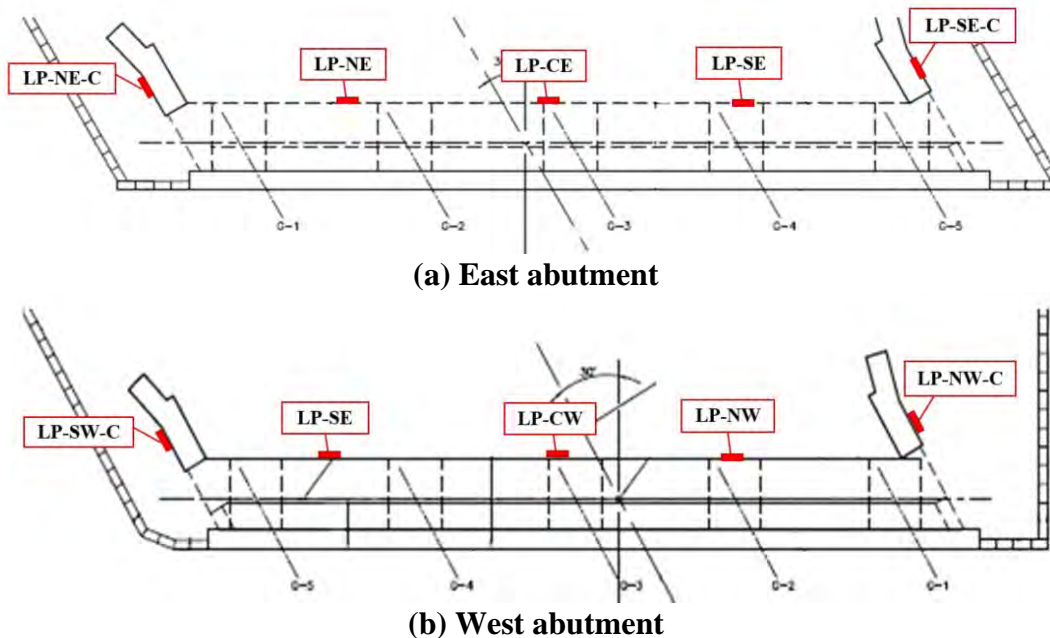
CPC instrumentation plan and nomenclature view for the SR 7A GRS-IBS. (Source: FHWA.)
